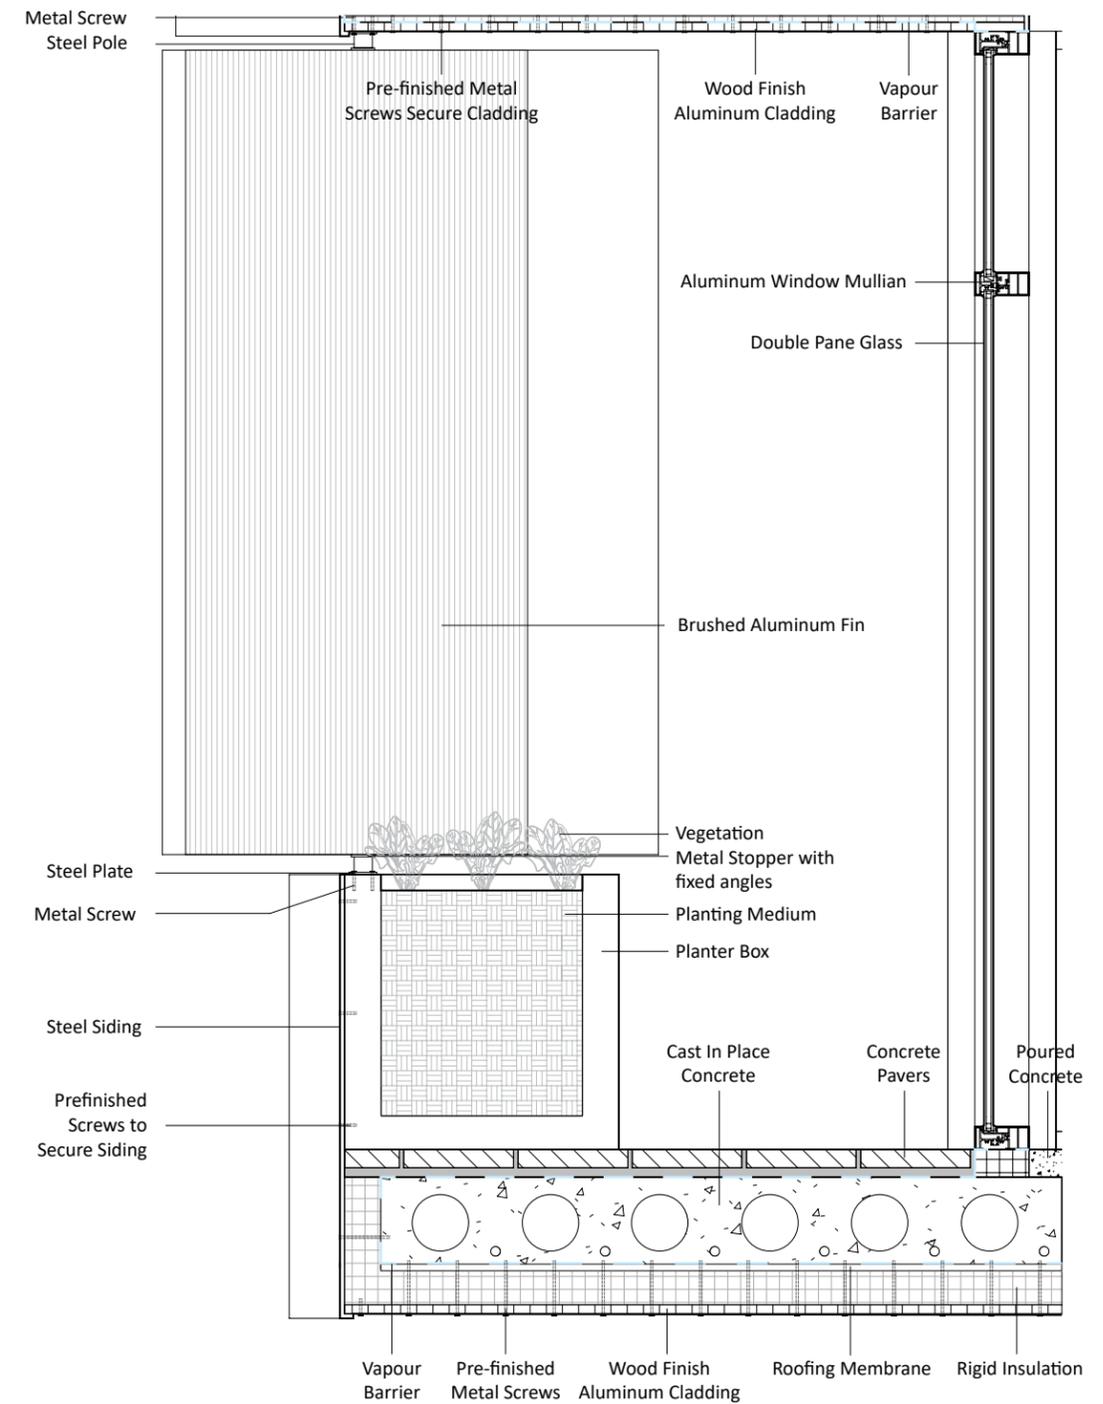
Vertical Fin Facade Detail. Image by Author.
